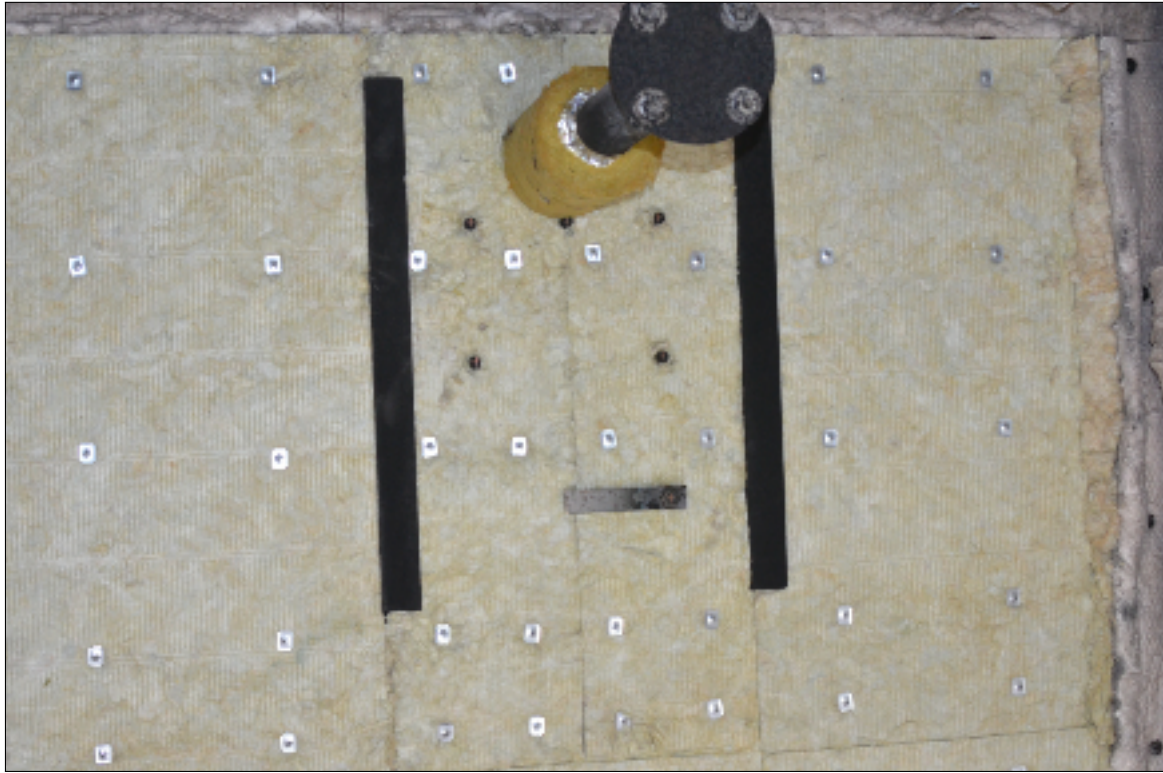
Test 7: Navy bulkhead test specimen with 50 mm of JM Minwool®1200 batting and pipe insulation installed
